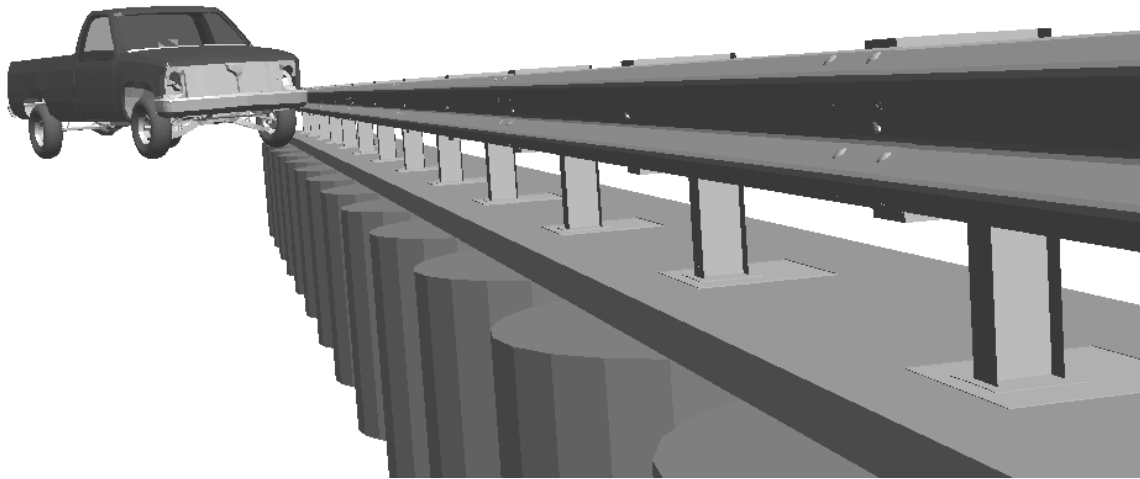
Initial Configuration for Steel Post Guardrail System in Concrete Mow Strip with Grout-filled Leave-outs.
